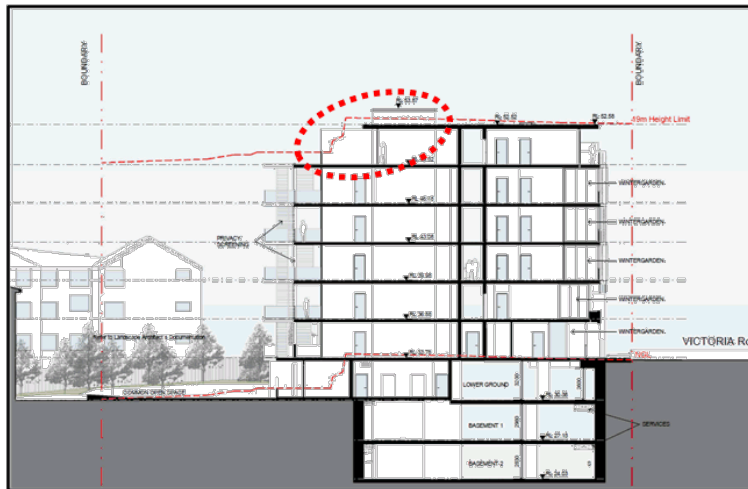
Extract of the Section Plan showing the elements of the built form that site above the LEP 19m height line
